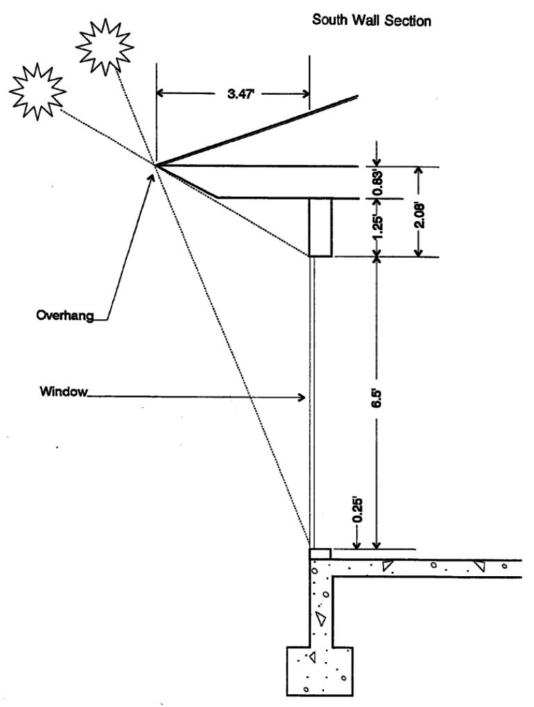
Case P105A South Wall with Overhang (ANSI/ASHRAE 2011, Figure 7-32)
